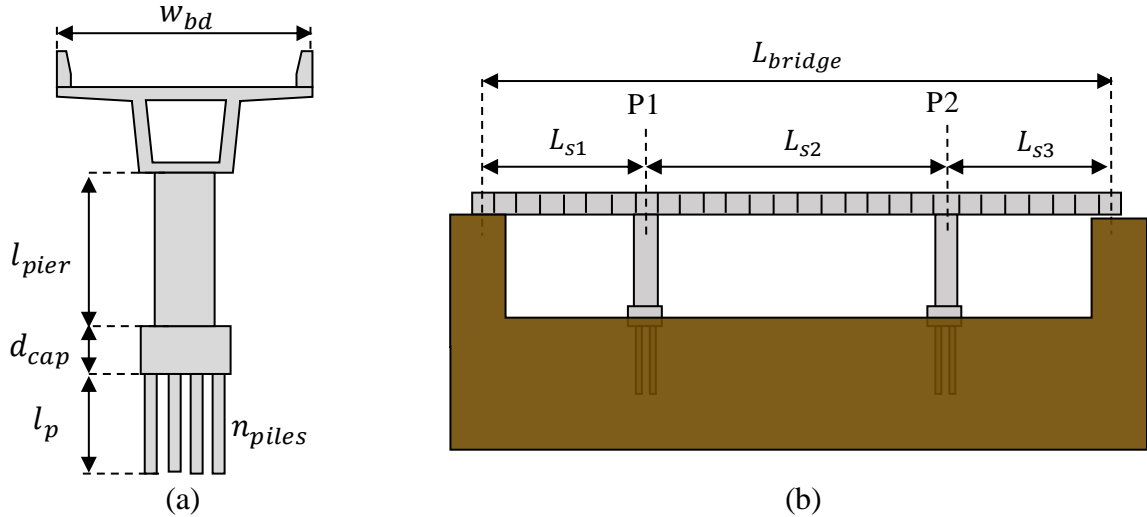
(a) Typical section for Bridge #4 and (b) elevation of balanced cantilever configuration
